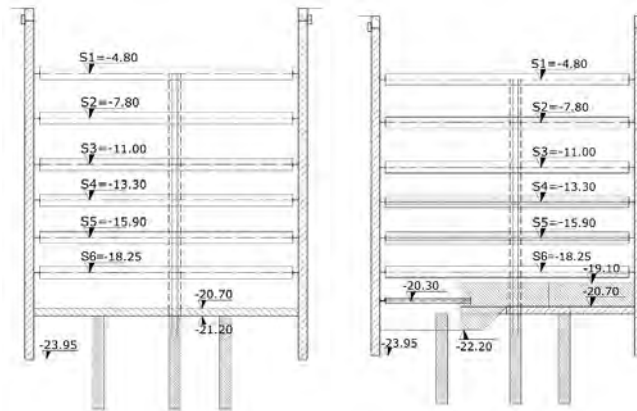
Strutting system configuration: a) general cross-section, b) cross-section through elevator pit
